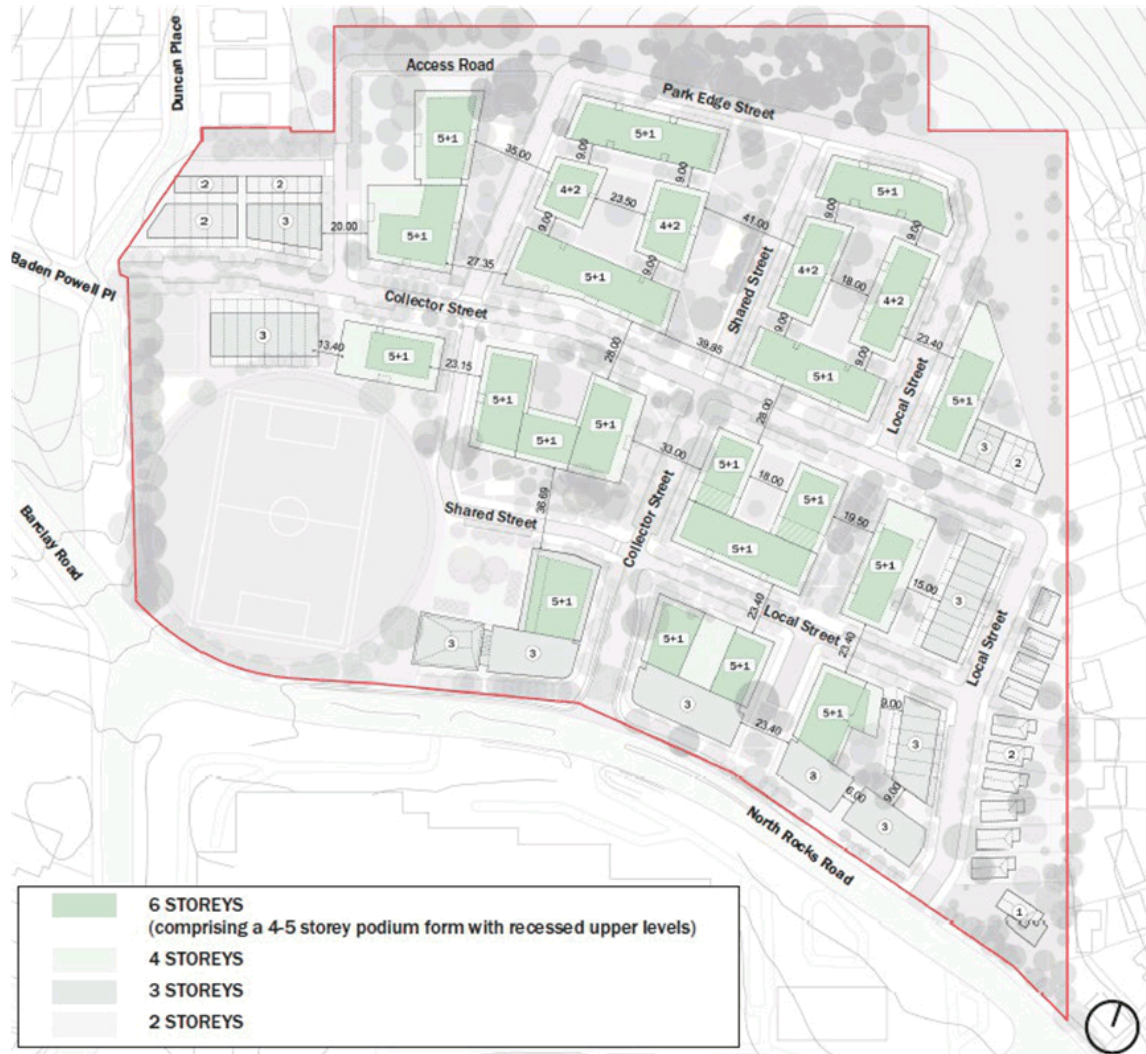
BUILDING HEIGHTS AND SEPARATIONS
